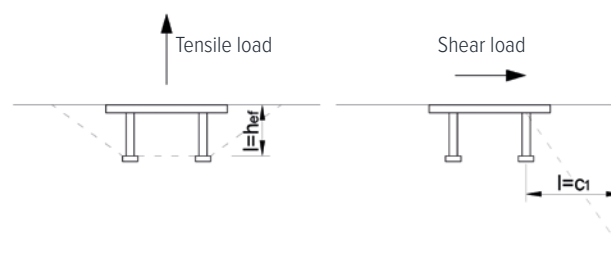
Examples of concrete failure under a) Tensile b) Shear load.
